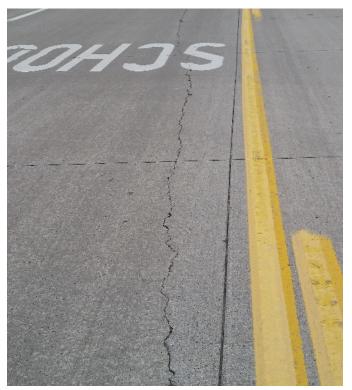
Longitudinal cracking in concrete pavements
